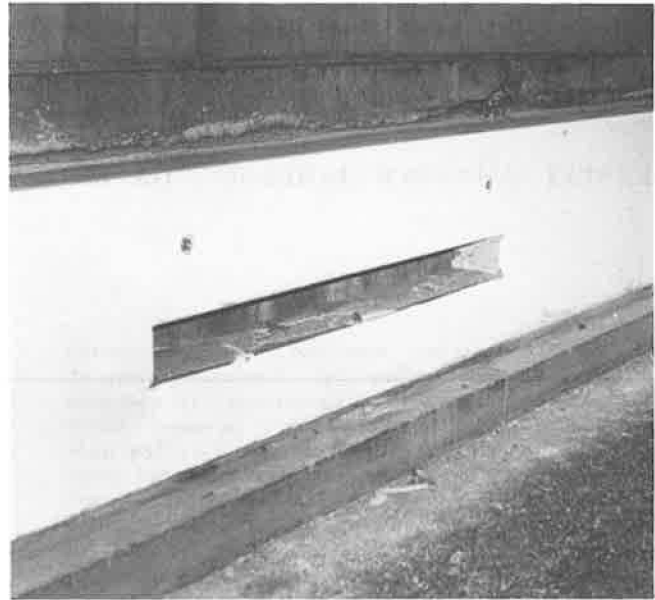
Sumner Tunnel, Boston: Work crew places conventional portland cement concrete with a superplasticizer additive between the polymer panel and the existing sidewall concrete.
